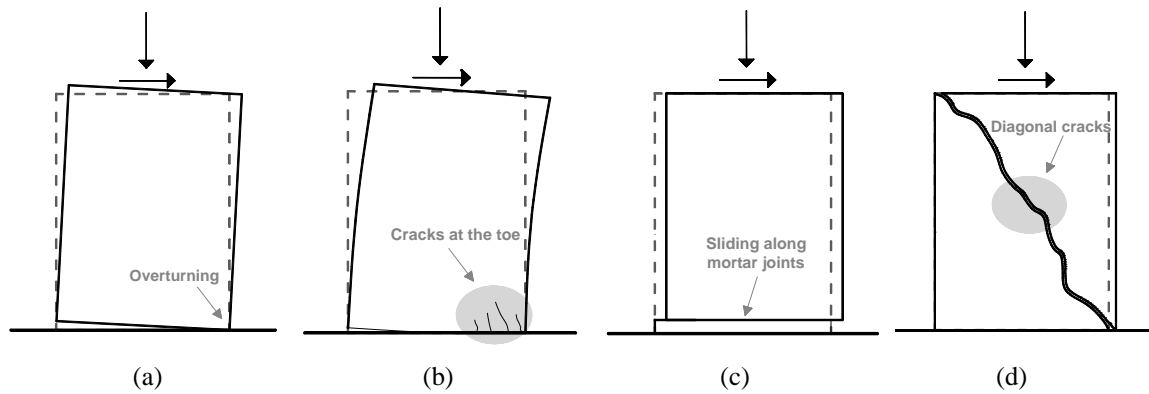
Typical failure mechanisms of masonry piers: (a) Toe crushing; (b) Rocking; (c) Sliding; and (d) Diagonal Cracking (adapted from Moon 2004 and Calderini et al. 2008).
